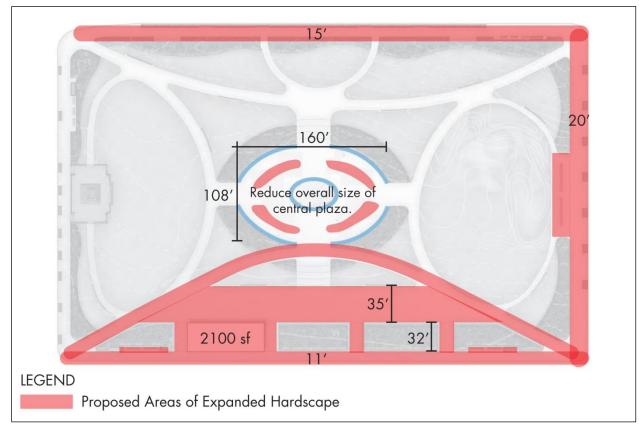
Alterative 3 Proposed Additional Hardscape
